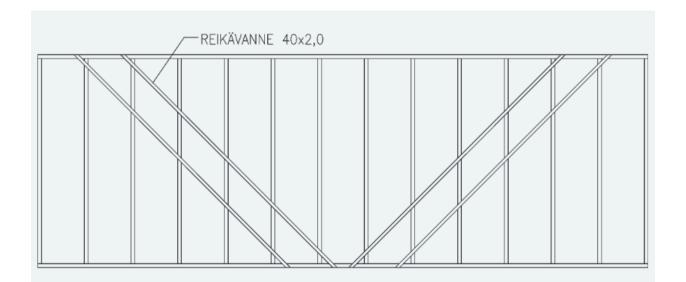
Perforated steel stiffeners for a wall element. Photo: <u>www.puuinfo.fi</u> (Woodfocus Oy - avoin puurakennusjärjestelmä – elementtirakenteet)
